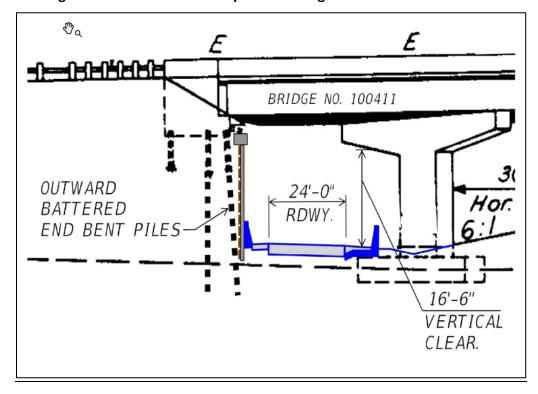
2-Lane On-Ramp Under Bridge-No. 100411 – Section View
